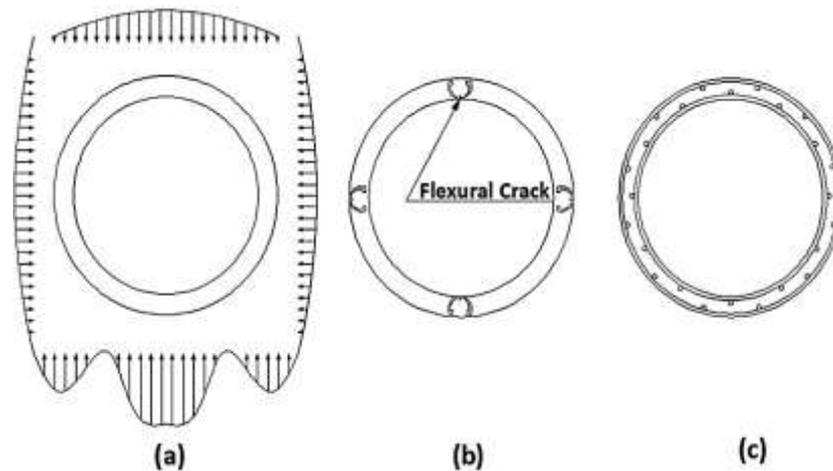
Concrete pipe: (a) external loads, (b) flexural cracks, and (c) reinforcement system.
